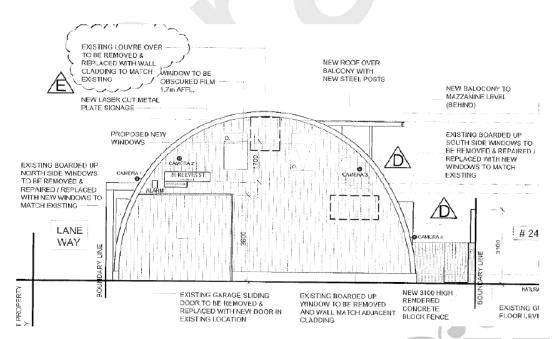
West elevation showing proposed works. Drawing dated 2009 (YCC BP).
